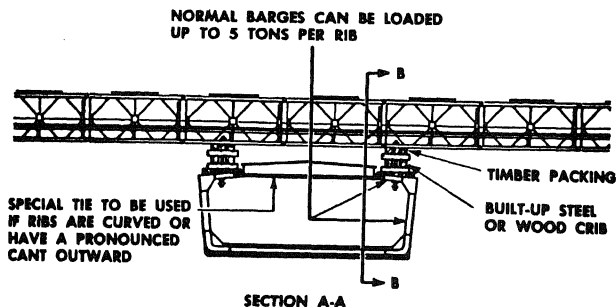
Adapting barges for gunwale loading. Section A-A.
